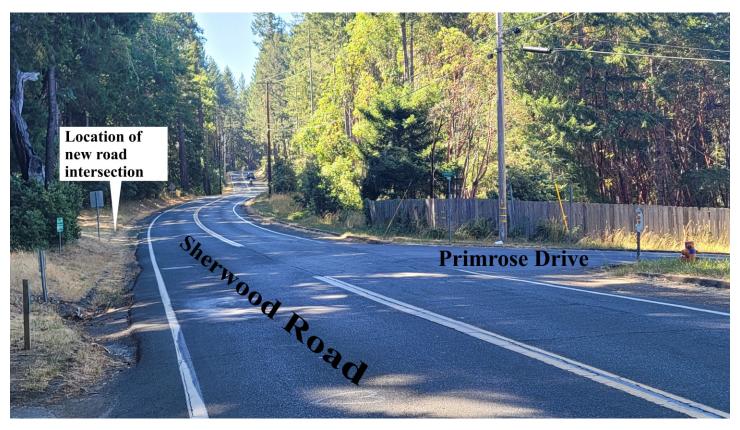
Sherwood Road looking south at the intersection of Primrose Drive. The proposed new road intersection is proposed to be on the East side of the road.
